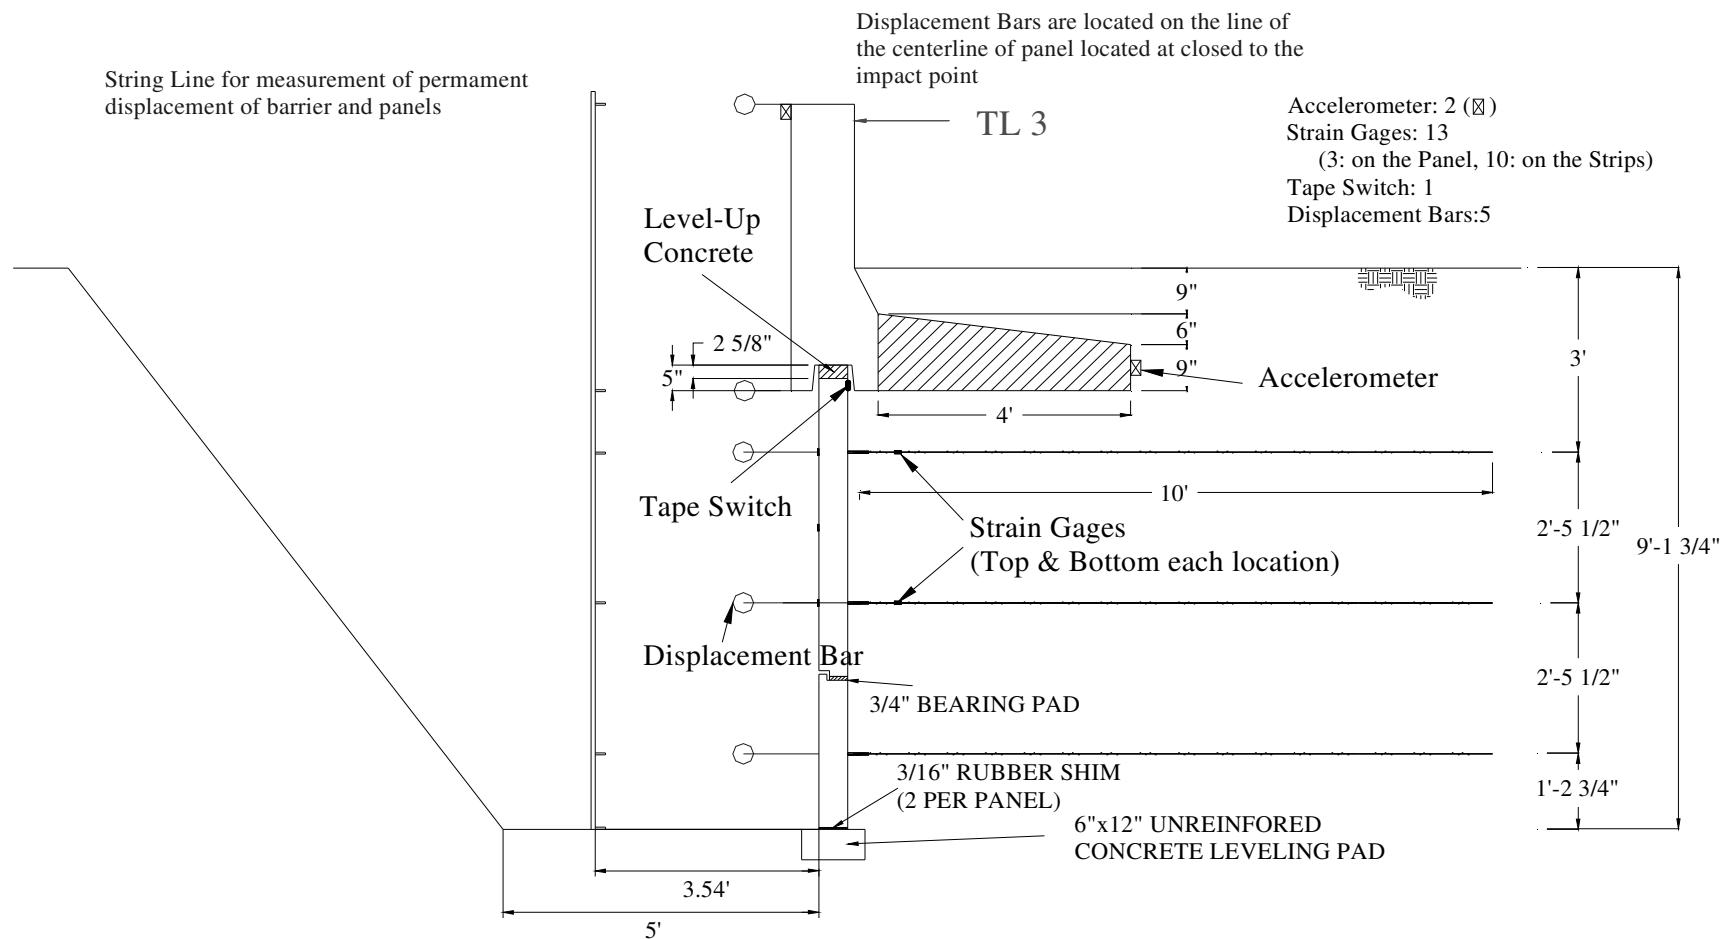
Side view of TL-3 crash test with 32 in. tall vertical wall barrier
